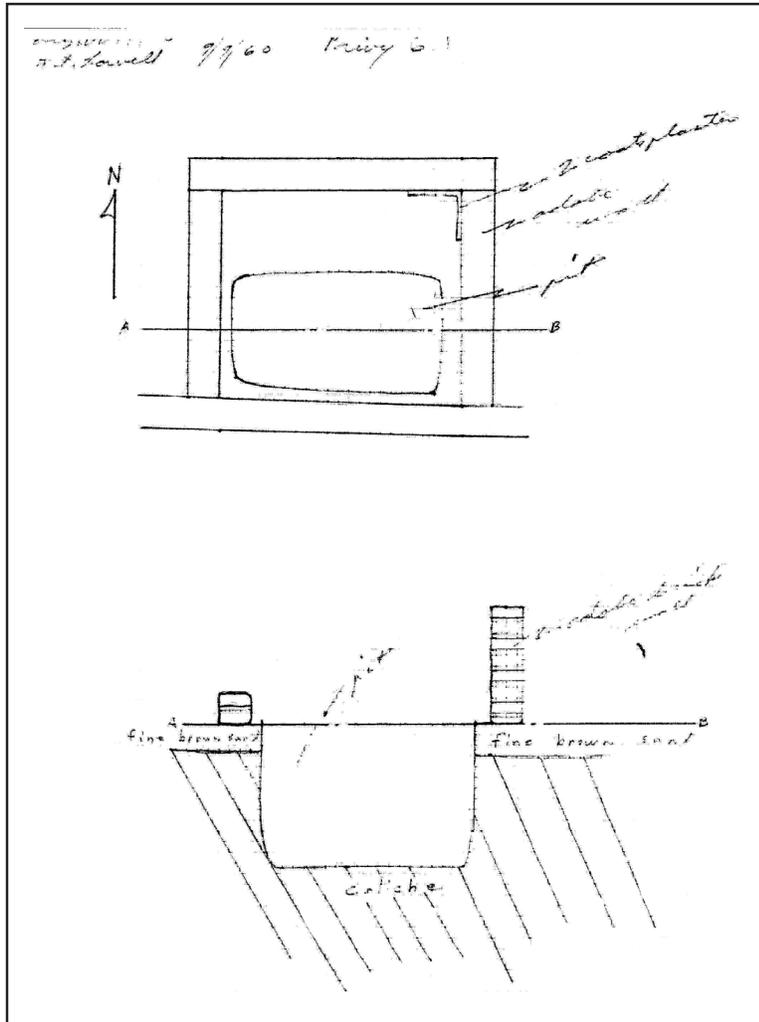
Plan view and cross section drawing of the privy at Fort Lowell officer's quarters no. 6, excavated in 1960 (AHS/SAD MS 265).
